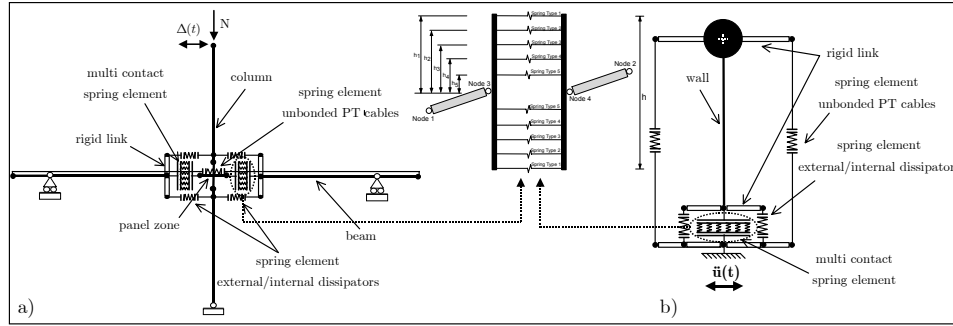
Multi spring modelling: a) Schematic beam-column subassembly model; b) wall specimen model.
